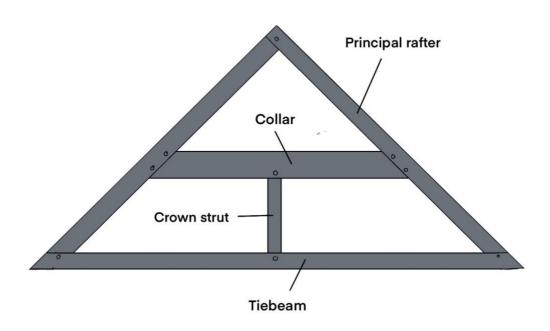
, Roof truss arrangement. (Roland Locke 2019).
